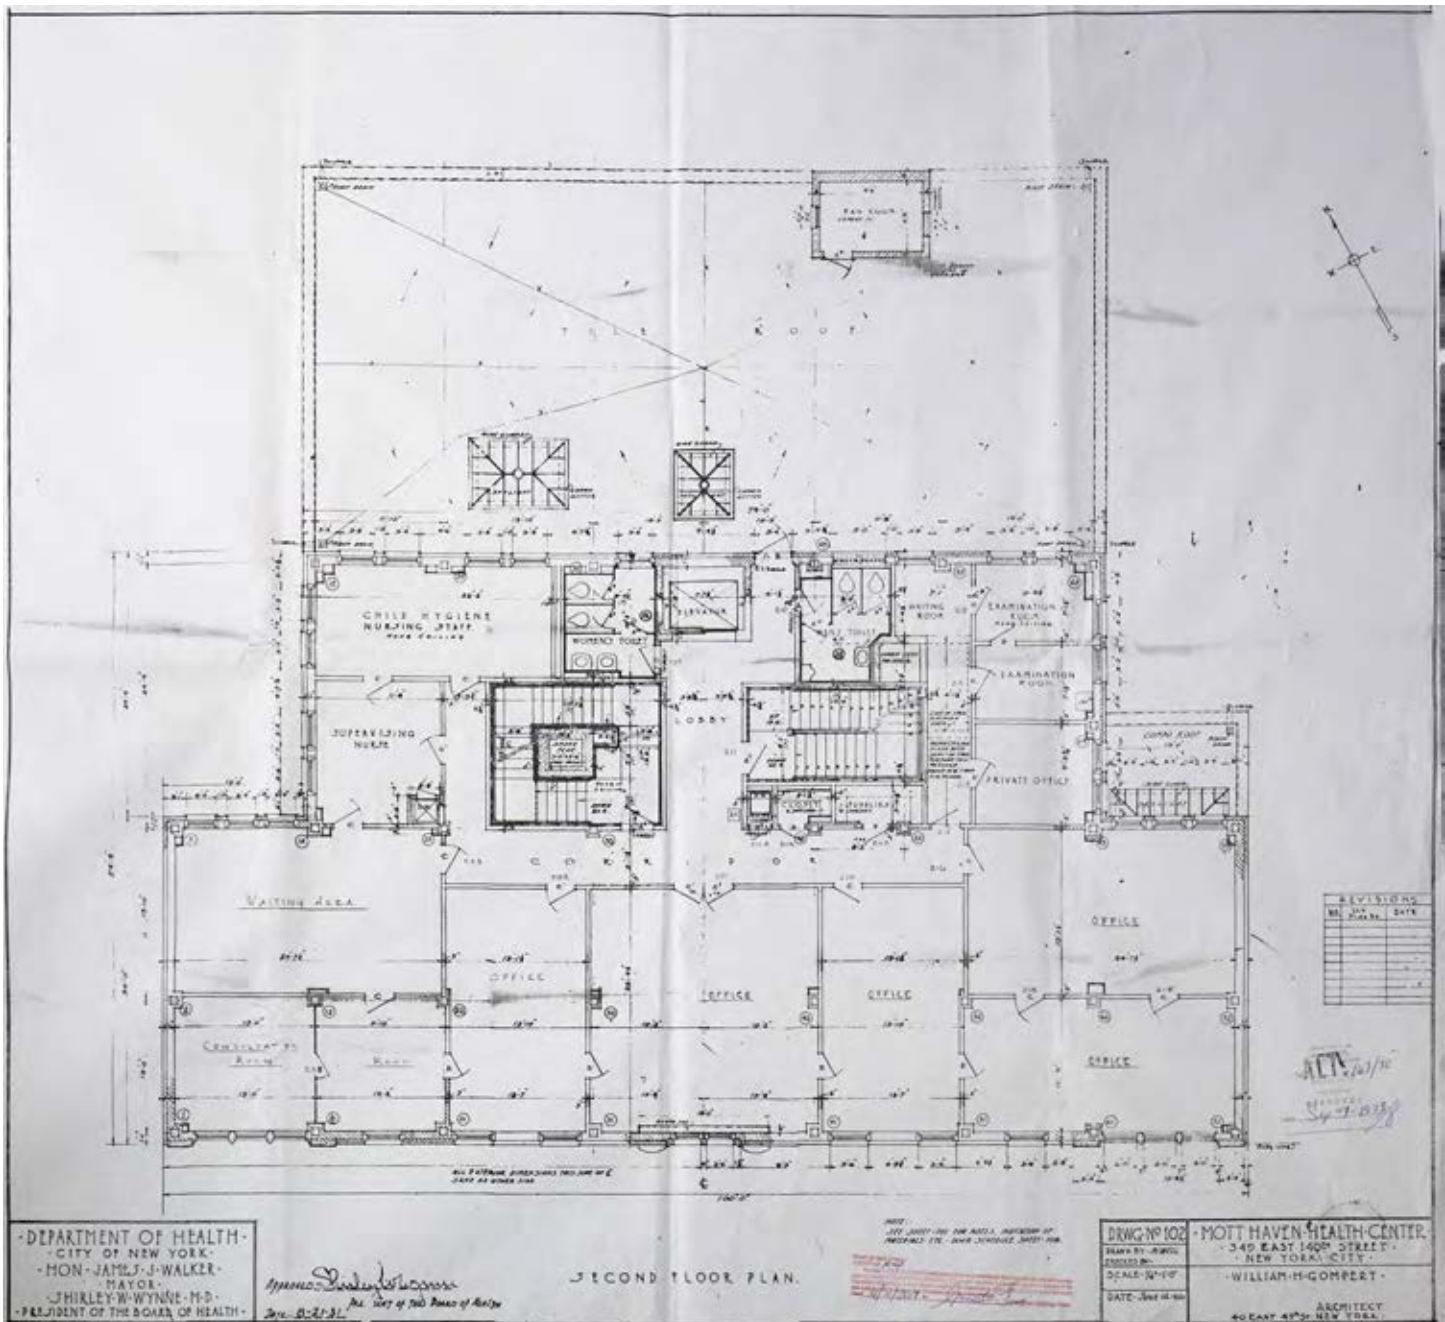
1931 second floor plan. (Bronx Department of Buildings)
